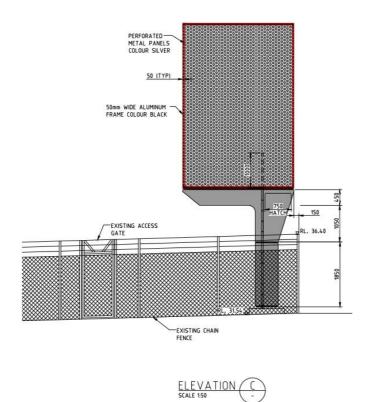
Rear elevation (Source: Dennis Bunt Consulting Engineers)
